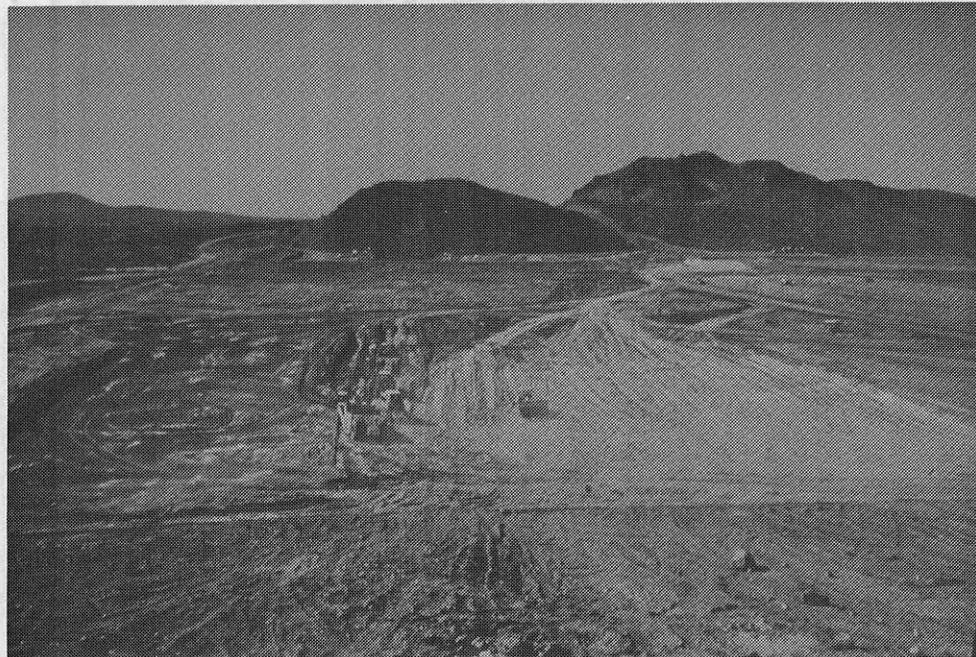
Foundation excavation using push cats, scrapers, and dozer. Note lighter colored areas of caliche, or bedrock in upstream portion of dam foundation. January 1984
